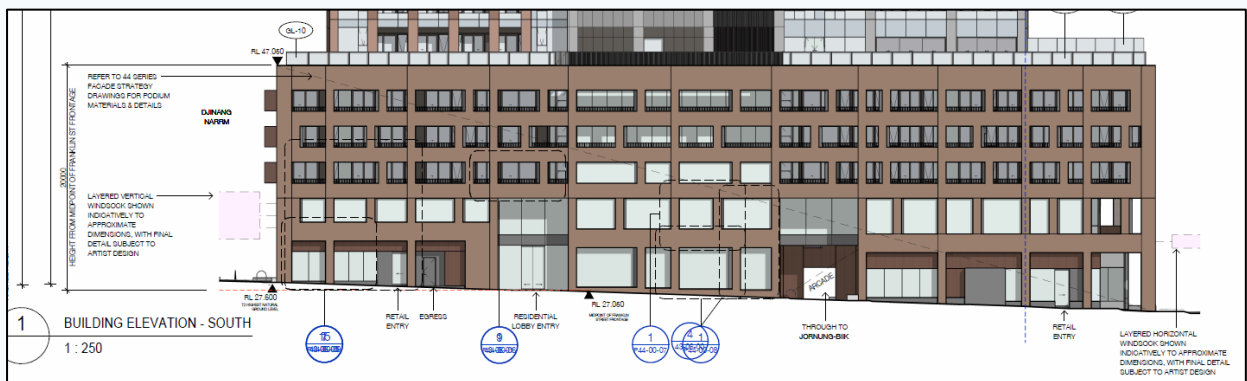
Podium height of Tower 2 along Franklin Street frontage (Source: Application)
